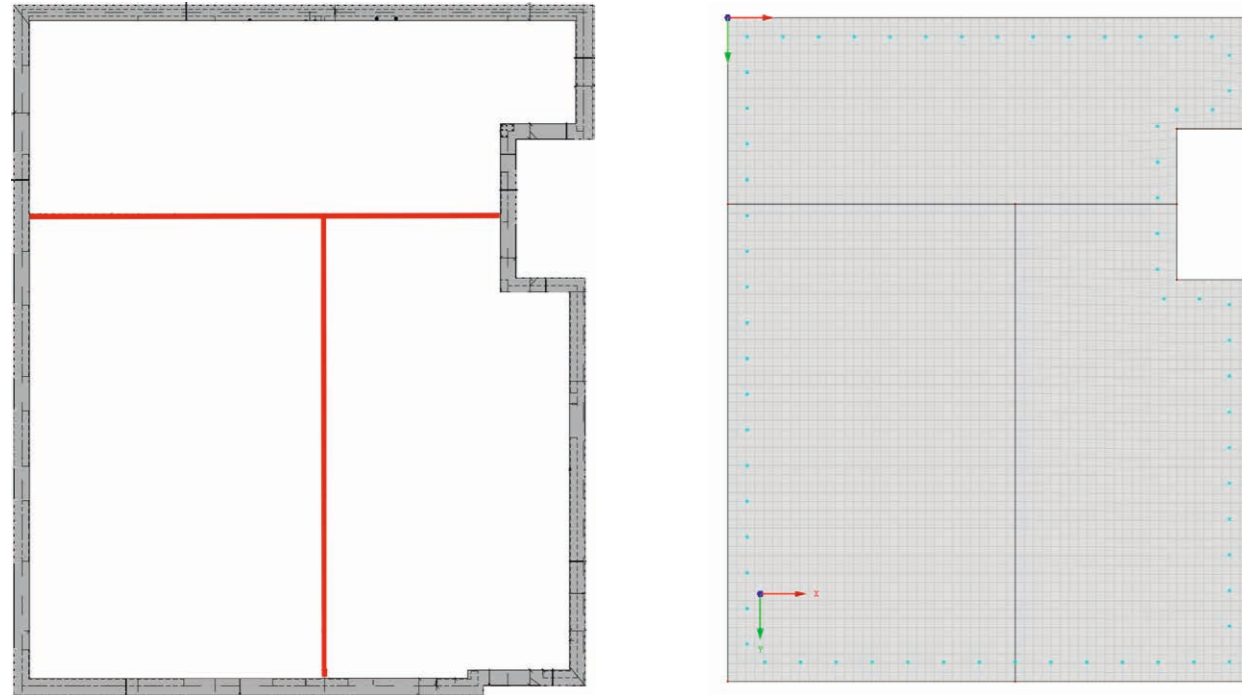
Plan view (left) and Finite element model of the foundation slab (right). The two red lines represent two load-bearing walls resting on the foundation slab.
